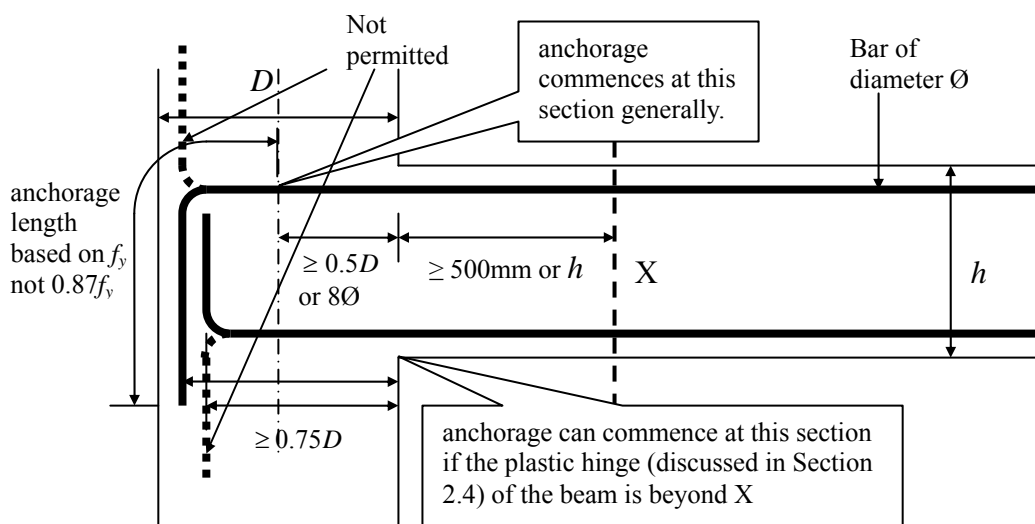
Anchorage of Reinforcing Bars at Support
